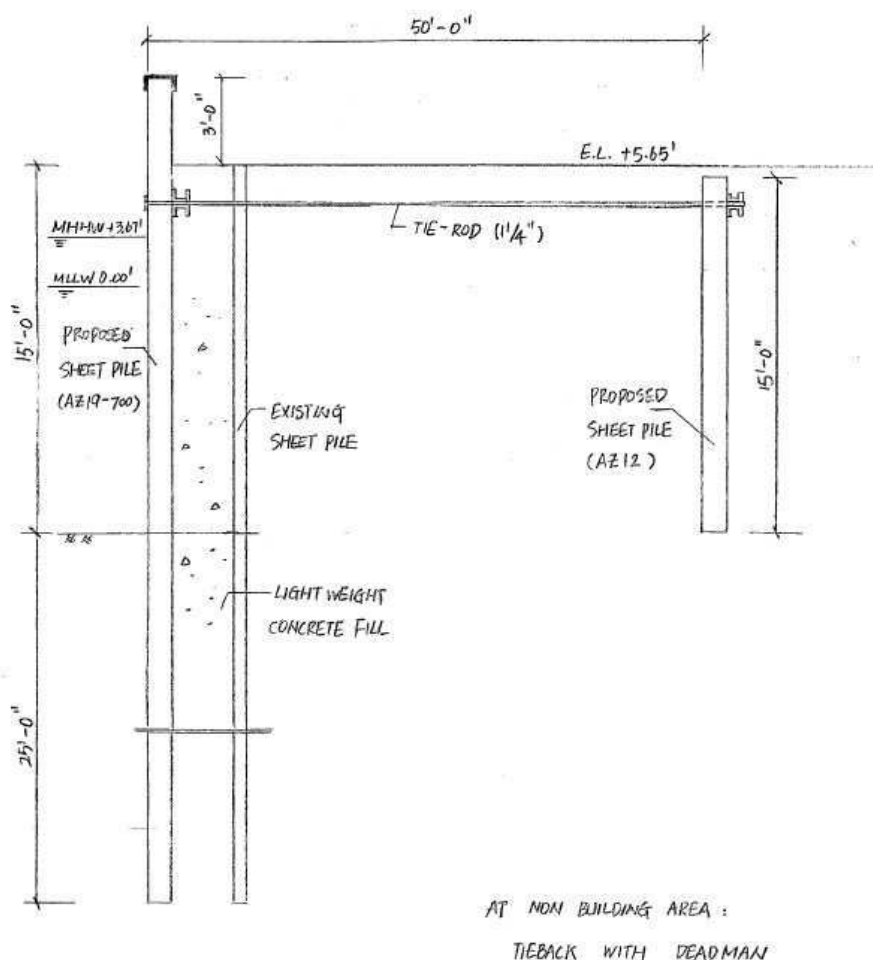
Typical Cross Section for Segments C & D for Alternative 2 (Tie back with Deadman Anchoring System)
